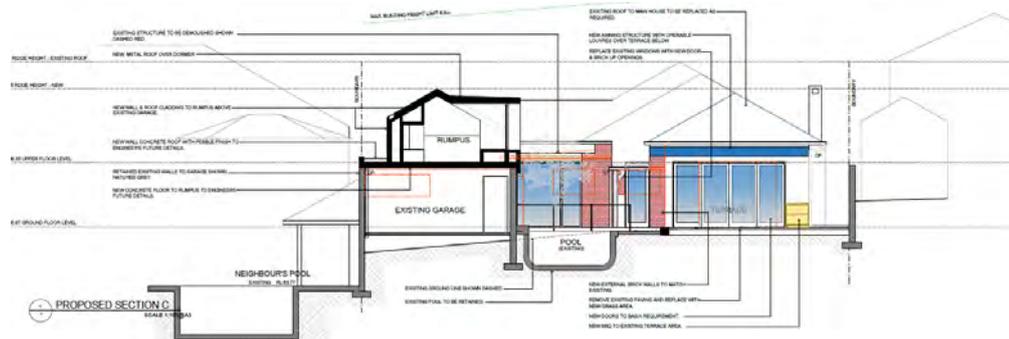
Proposed section C. (Source: Castlepeake Architecture)
